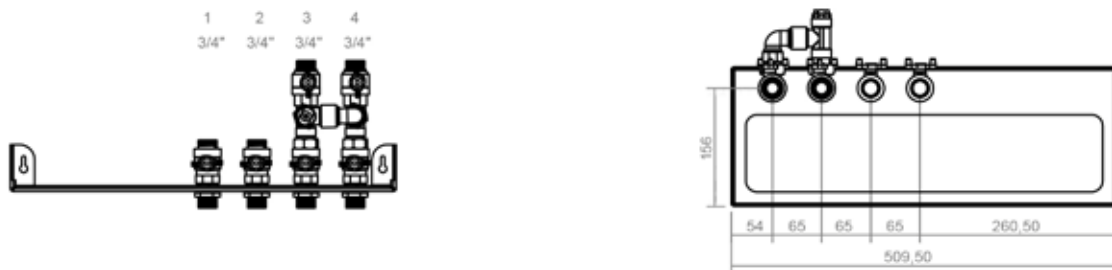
The drawing and dimensions of the Mounting Plate with Ball Valves and Flushing By-pass of HIU-Indirect
